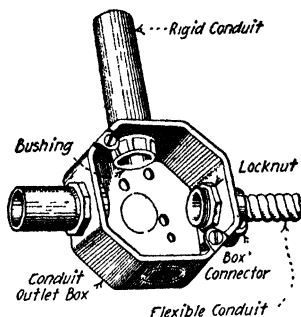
Showing rigid and flexible conduit connections to an octagonal conduit box.
